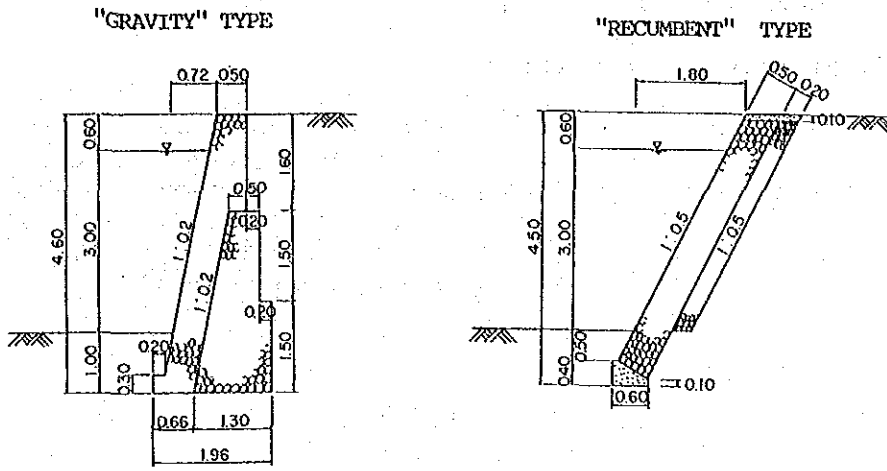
STRUCTURE OF BANK PROTECTION
